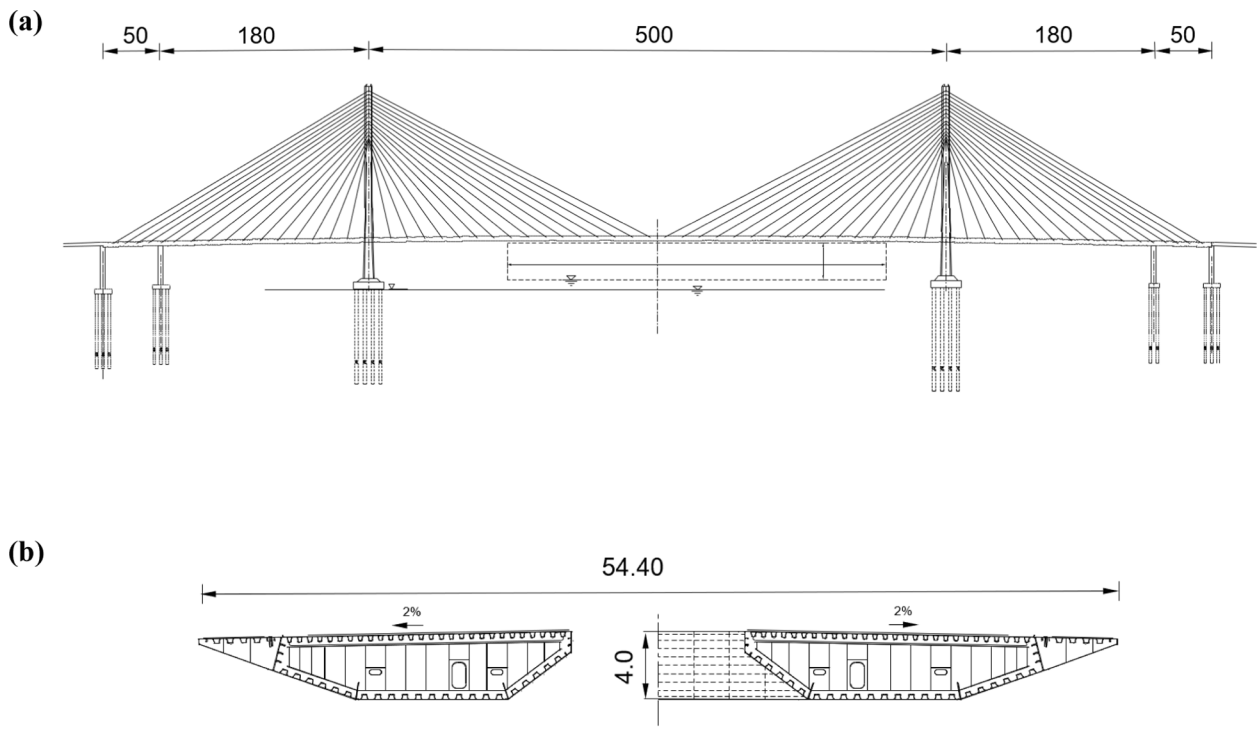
Puyi Highway Jiajiang Bridge: (a) elevation of bridge; (b) two separated steel box girders; (Unit. m).
